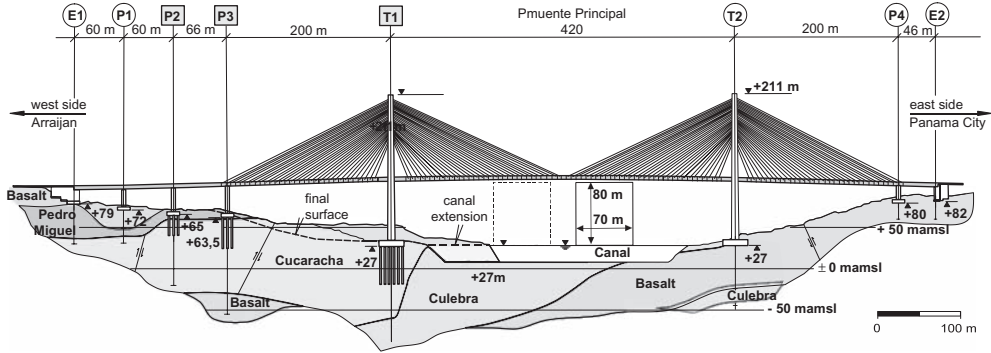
Longitudinal section of the new 'Puente Centenario' crossing the Panama Canal with subsoil conditions.
